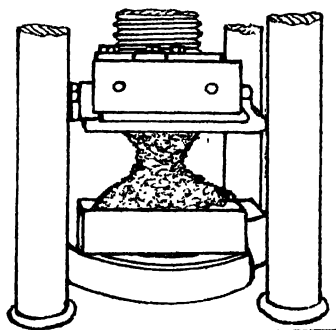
ENLARGED VIEW SHOWING PYRAMIDAL FRACTURE OF A CUBE
